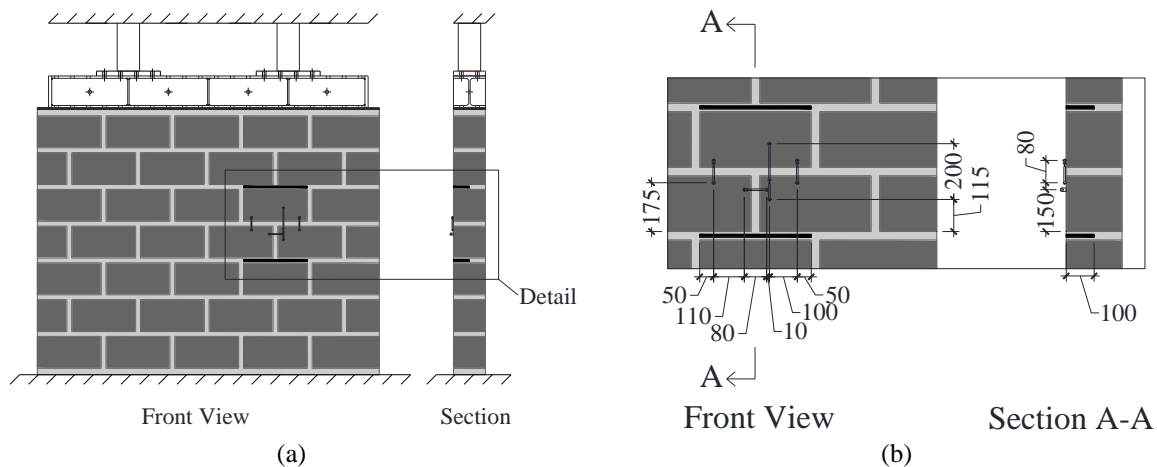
Double flat-jack test schematic layout: (a) location of flat-jack slots within the regular masonry wall; and (b) detailed view including the dimensions and locations of the LVDTs in millimeters.
